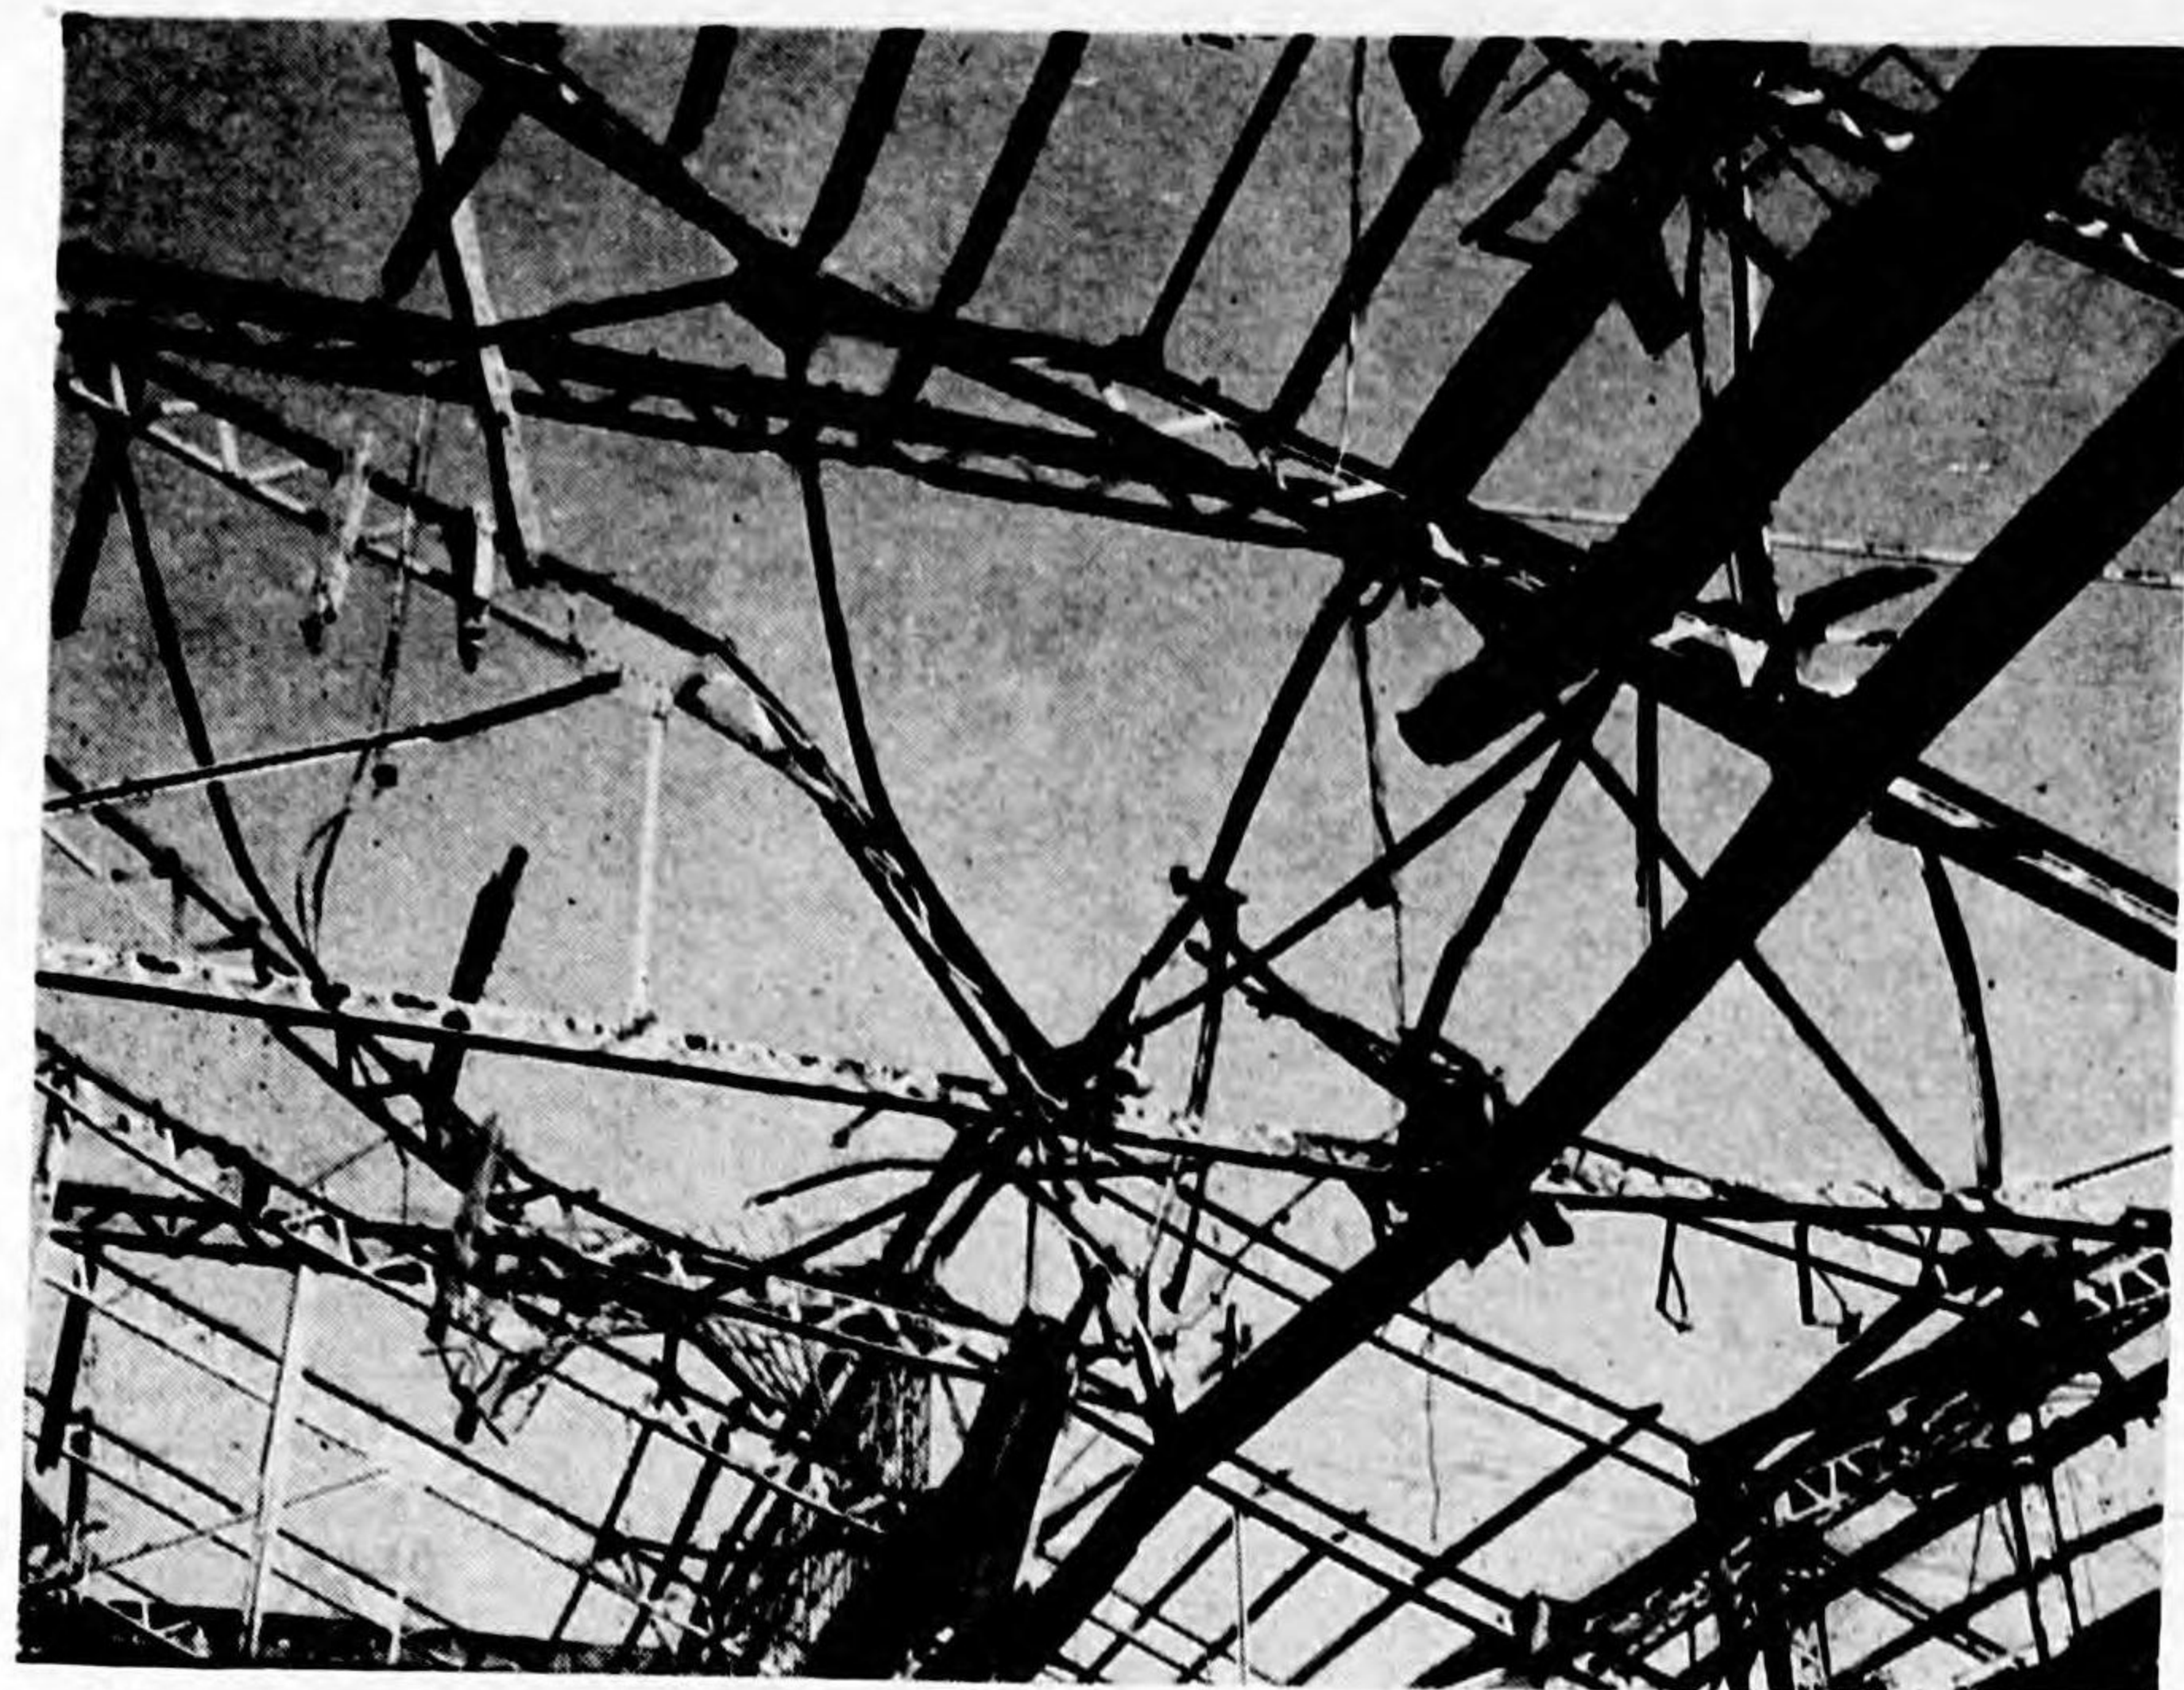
Building 3, Bomb 15; damaged roof steel; bent crane runway.
